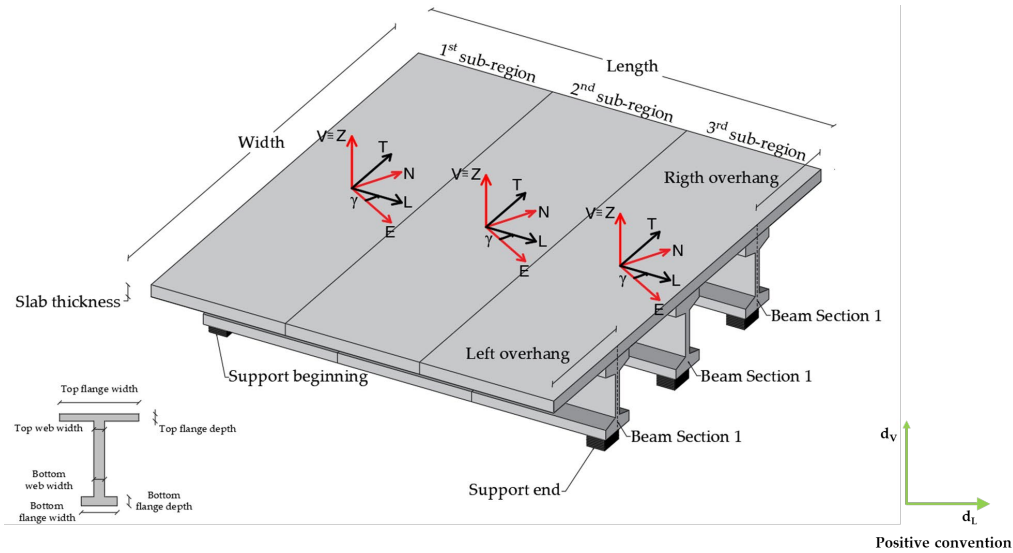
Deck and beam information defined in the QTableWidgtes of “Deck section design” and “Beam section design” QFrames for a single span. Green reference system on the right shows the convention sign for bridge displacements of Step 2 and 3 in the case in which the bridge centreline is drawn from the left to the right, which is from the beginning of 1st sub-region to the end of 3rd sub-region in figure.
